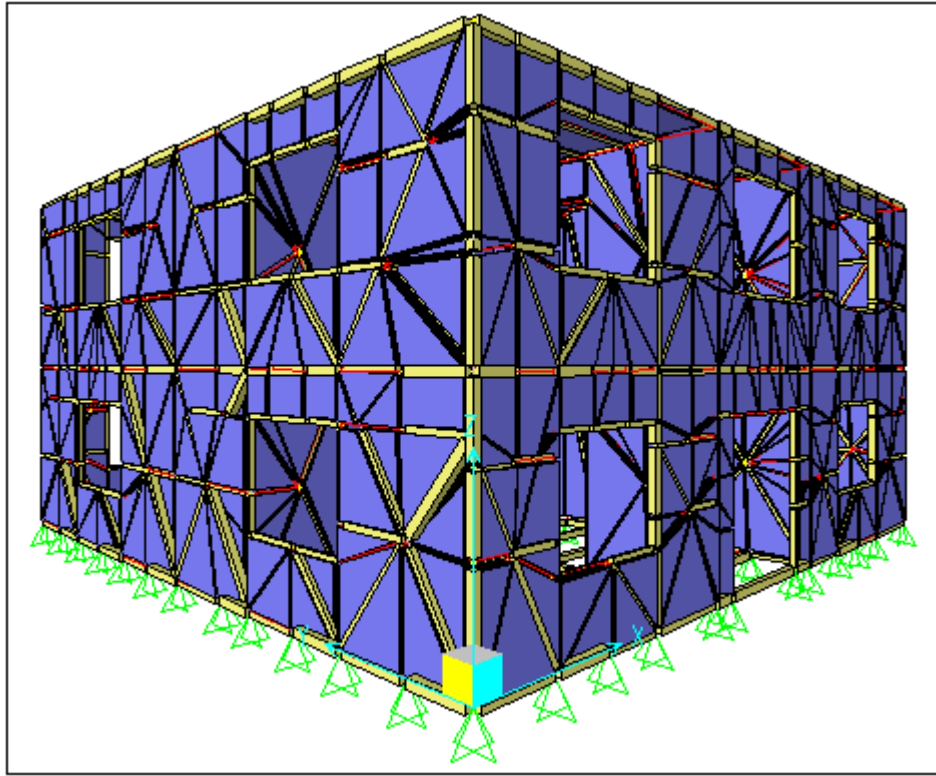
Undeformed Shape of Hımiş Structure Without Infill Material
